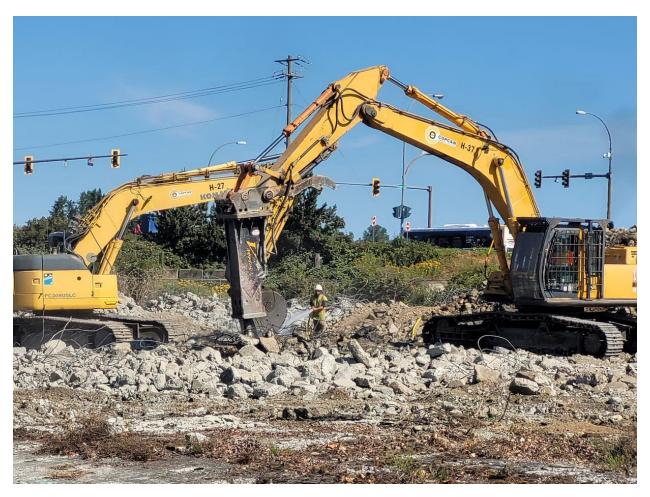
Excavators working to break concrete and removal metal, while a construction worker sprays the material to keep dust down.
